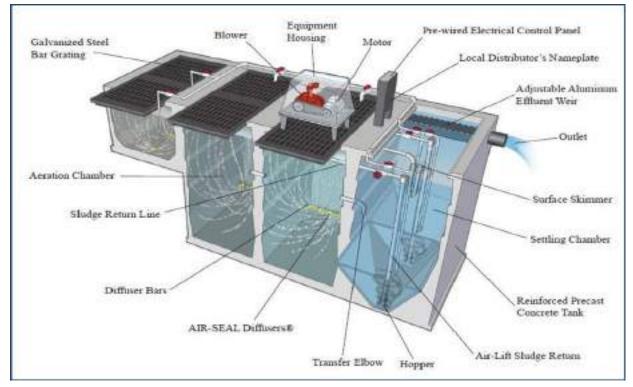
The Packaged Waste Water Treatment Plan Model
